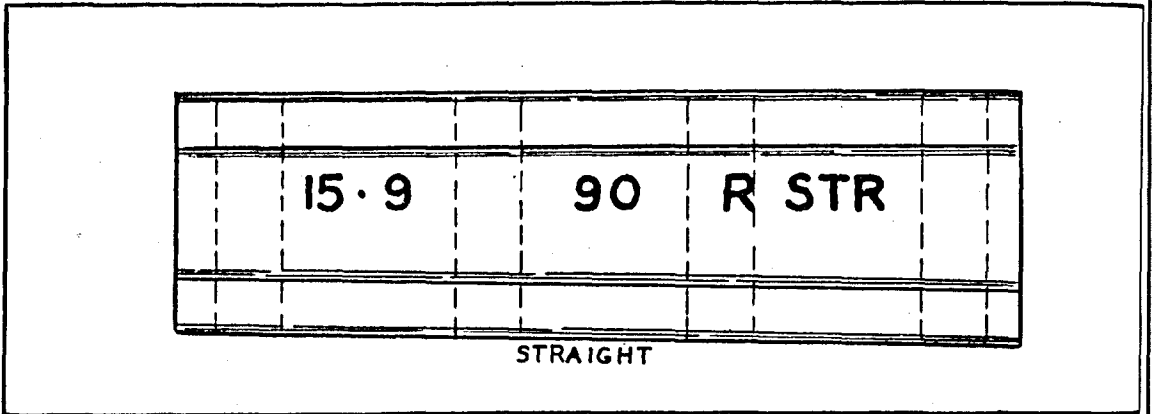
1938 STANDARD HEEL BLOCK 90&110LB.
